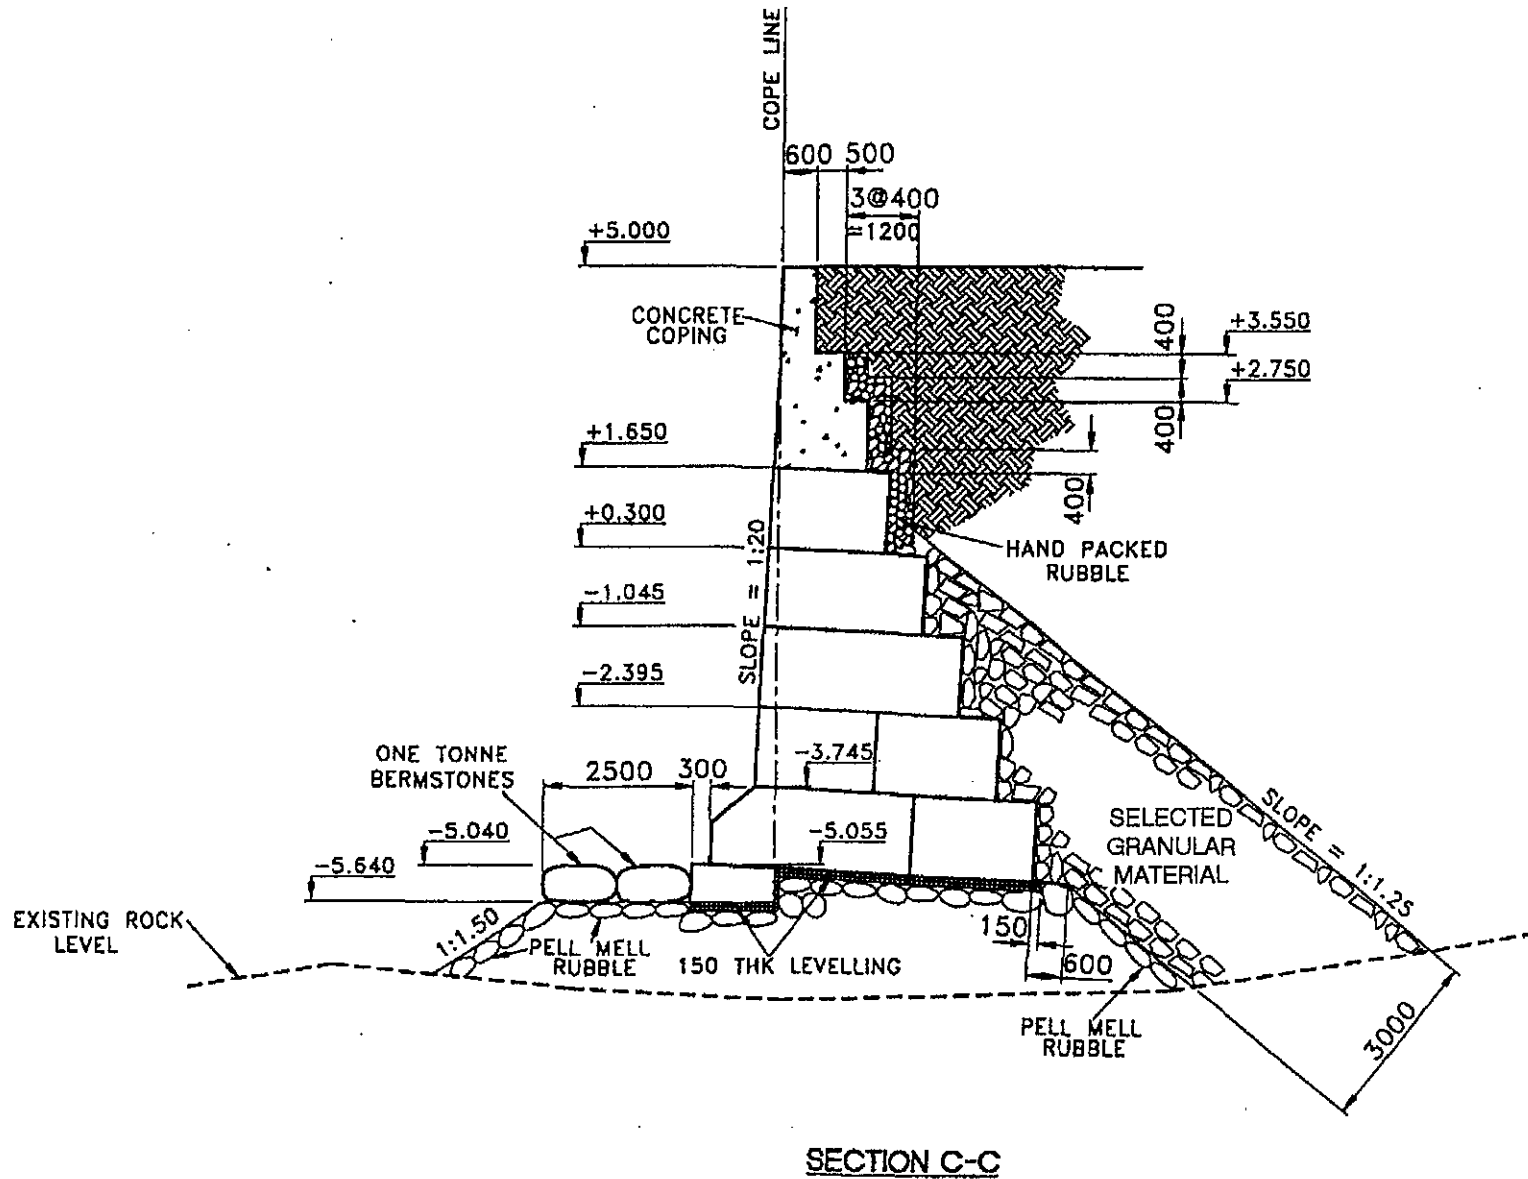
Typical Cross Section of Sea Wall (Section C-C)
